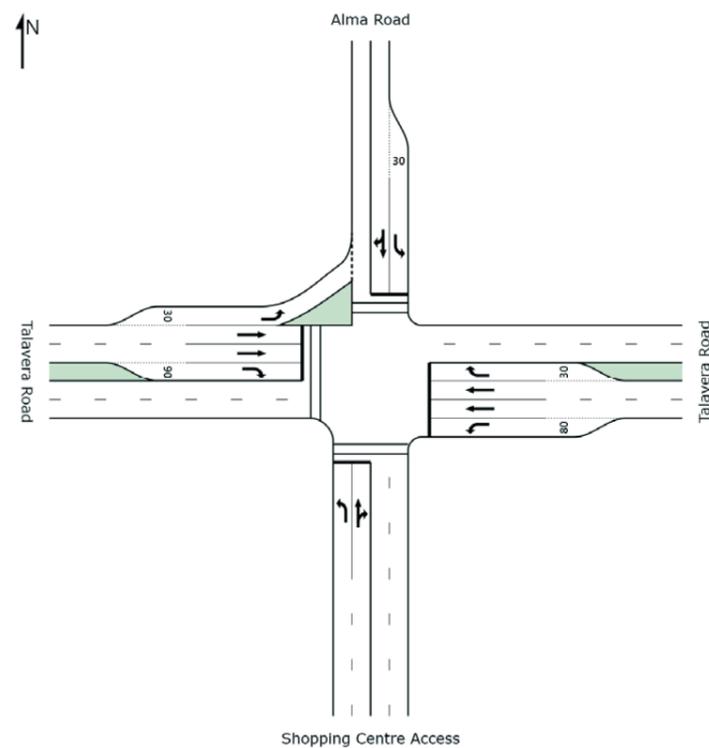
Alma Road/Talavera Road Intersection Configuration
